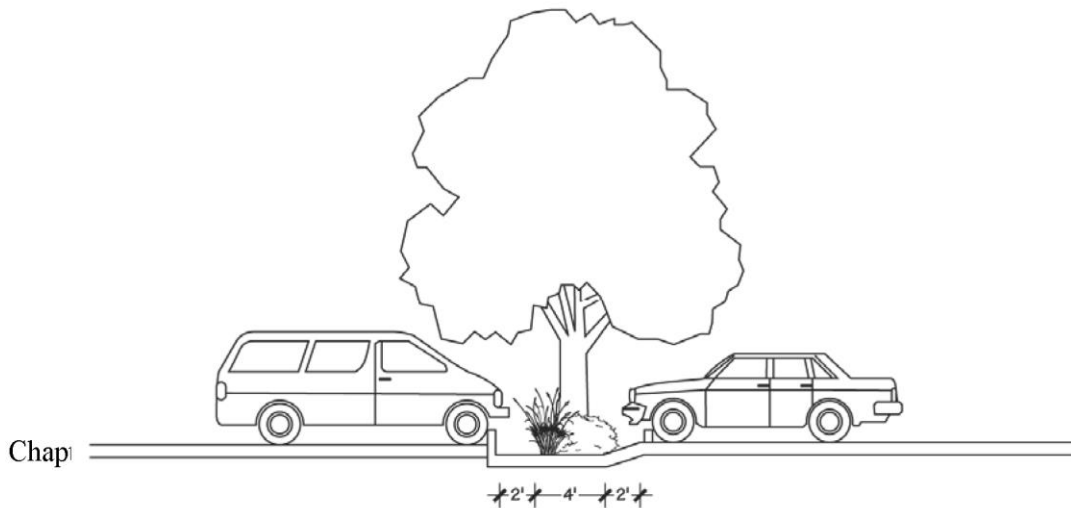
OFF-STREET PARKING AREA LAYOUT REQUIREMENTS
